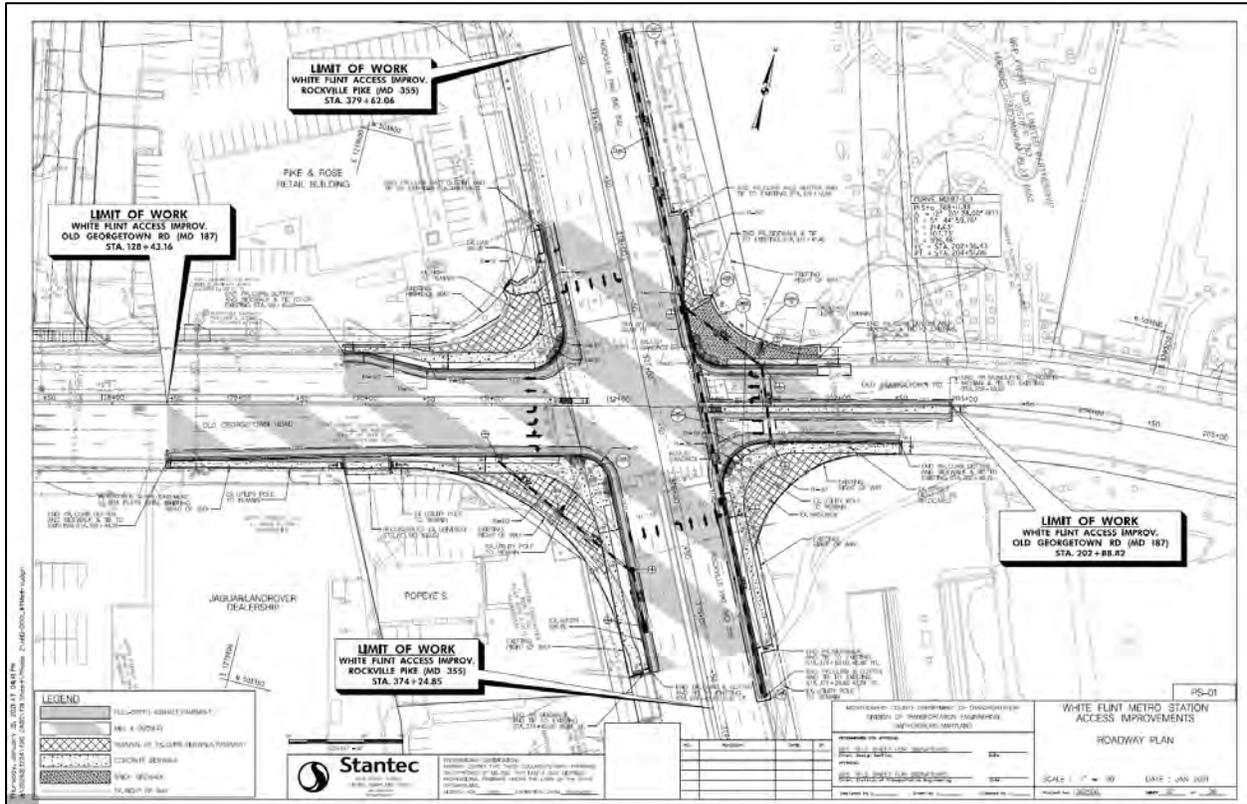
Plan View – Rockville Pike (MD 355) at Old Georgetown Road
